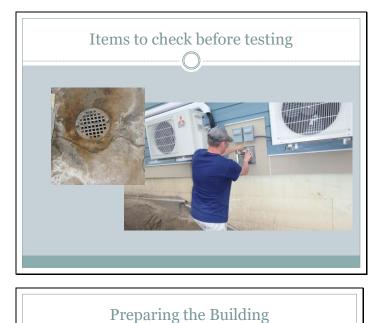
Floor Drain – may be dried out, fill before test Photo 2 – Continuously operating HRV/ERV supply and exhaust
